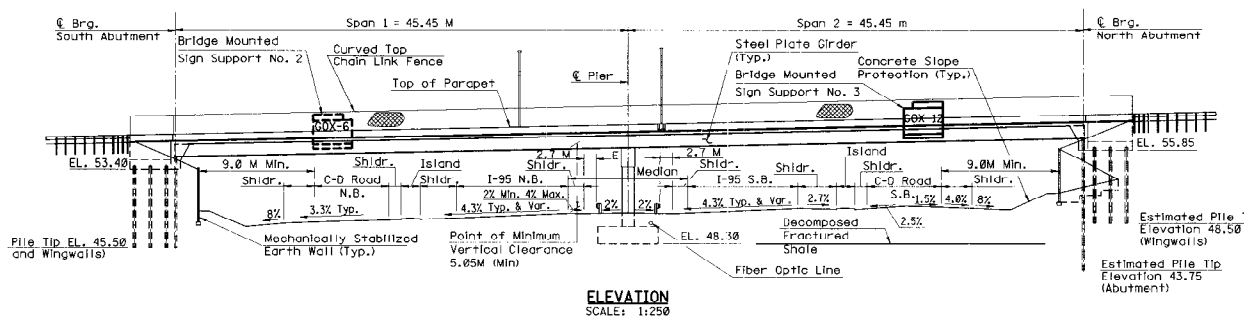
Scotch Road Bridge – Elevation (Courtesy of NJDOT)
